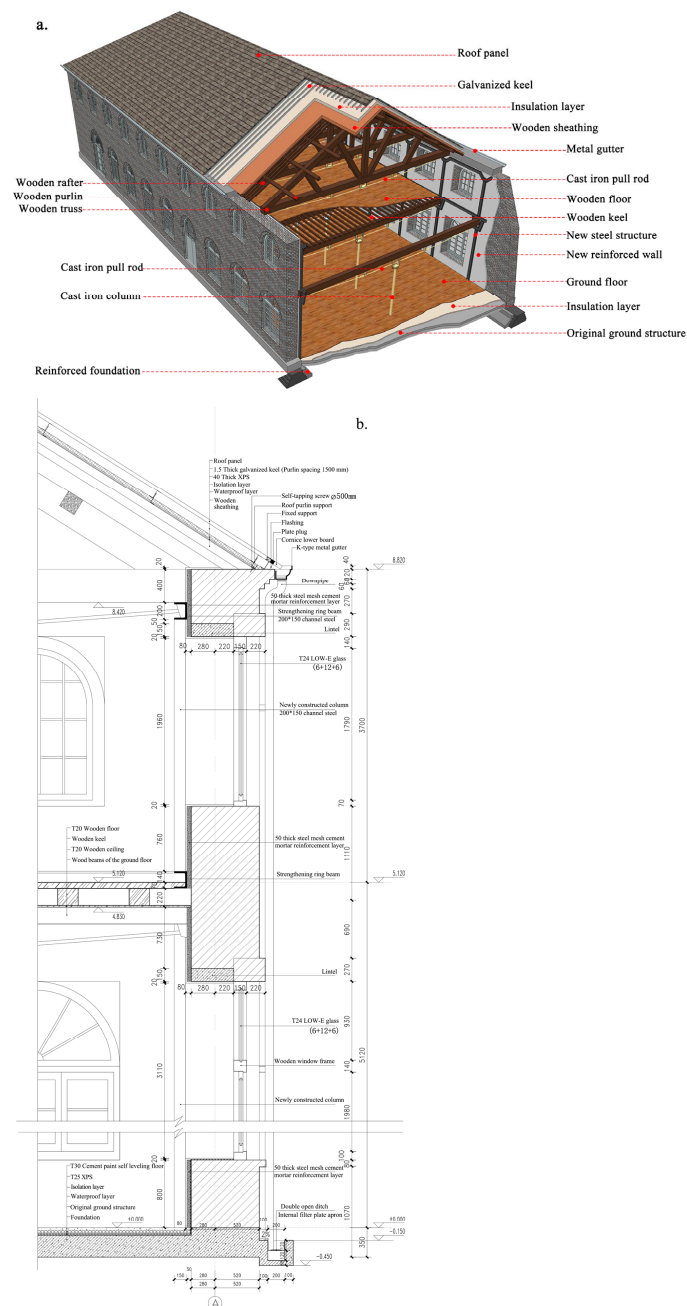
Diagram of reinforcement of foundation (left) and wall (right). Picture by X.X.
